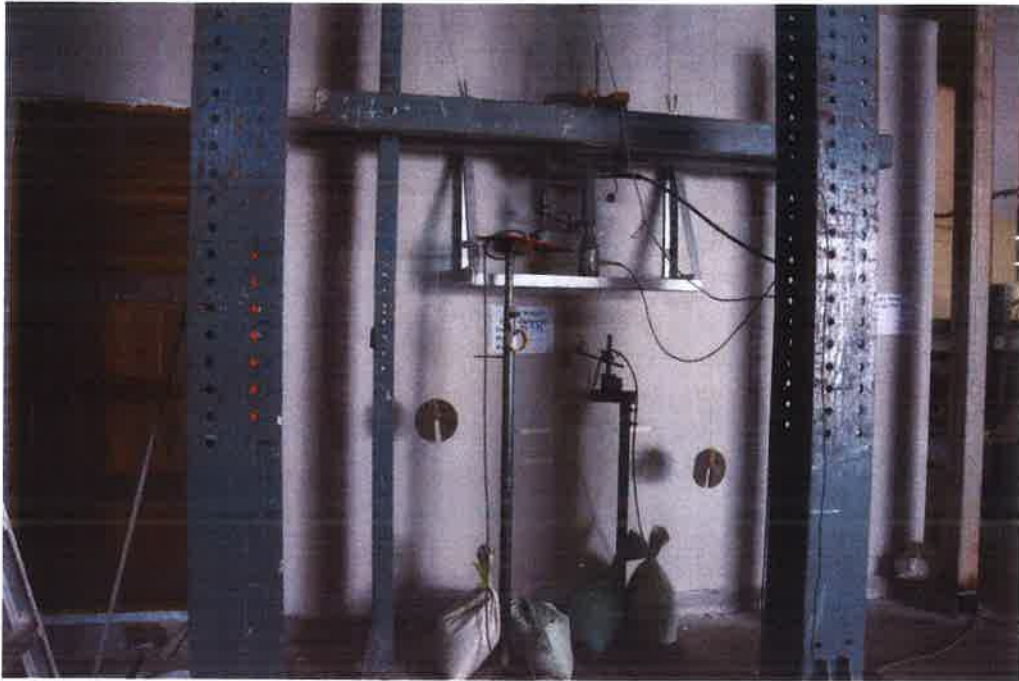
Heavyweight anchorage by eccentric downward loading (wall cupboard)
